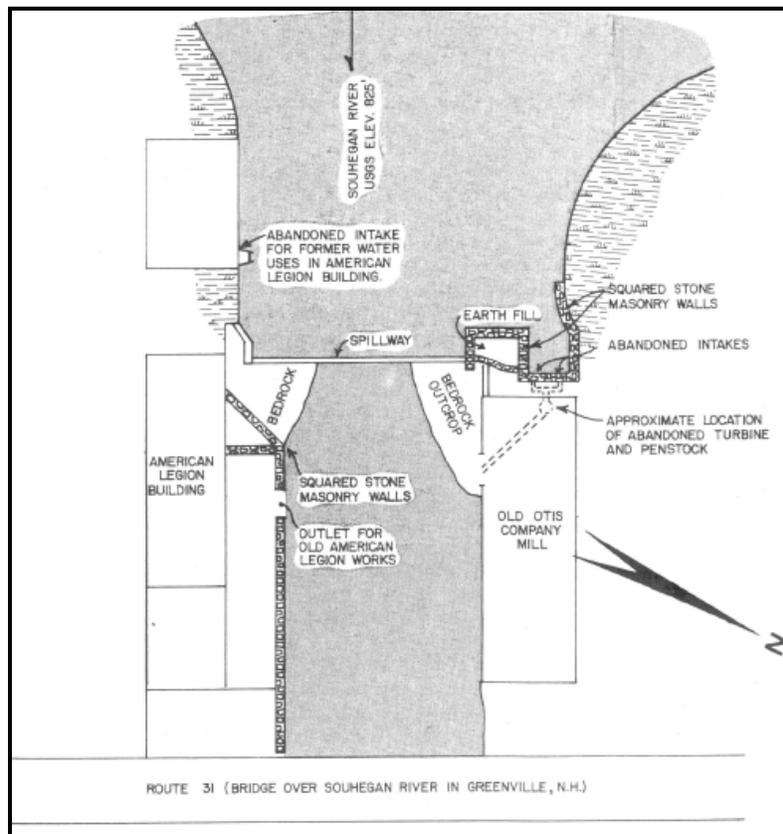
Otis Falls Plan Schematic (NHDAMS Data Sheet 2007)
